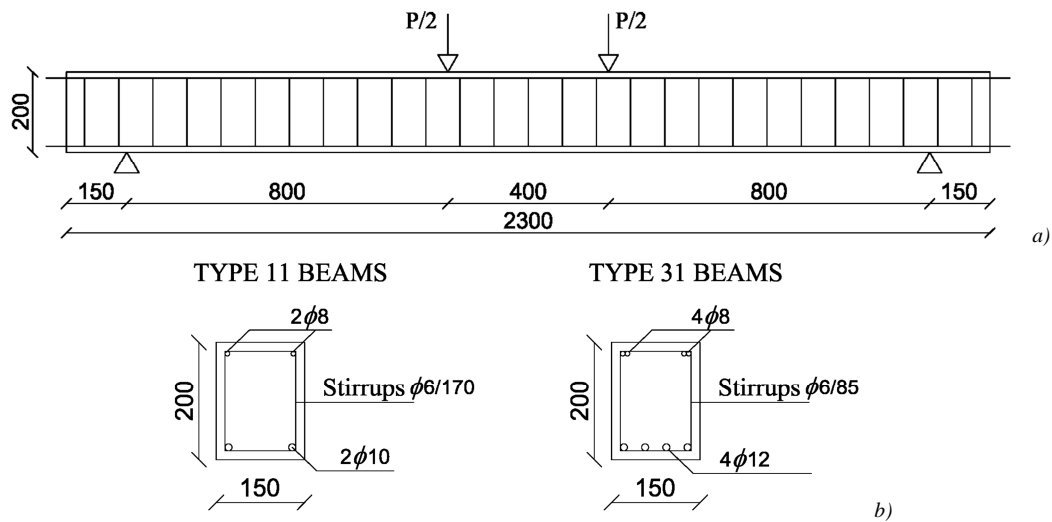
Scheme of the tested beams: a) Longitudinal section; b) Cross sections of type 11 and 31
